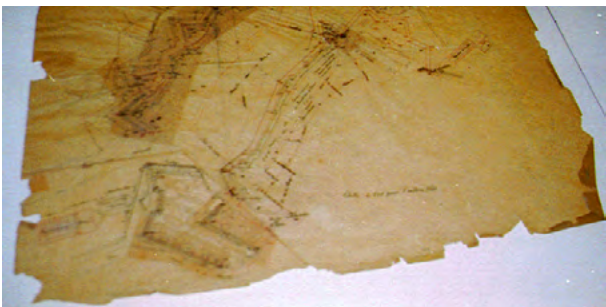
Plans-reliefs Museum, Paris: Fort de Joux Work plan
